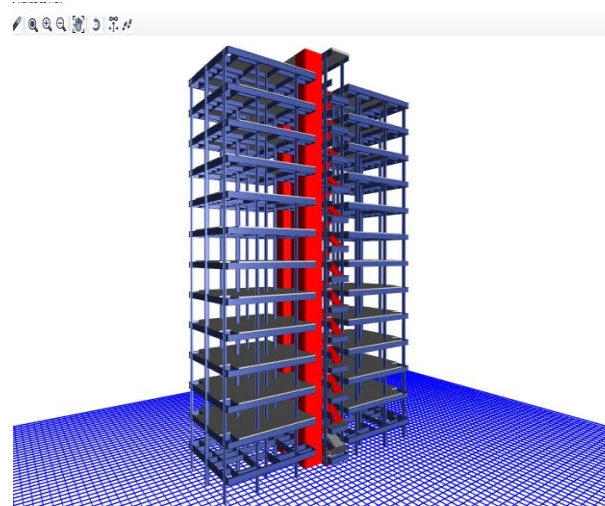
Extruded 3D view of G+ 15 storied building models with properties.
